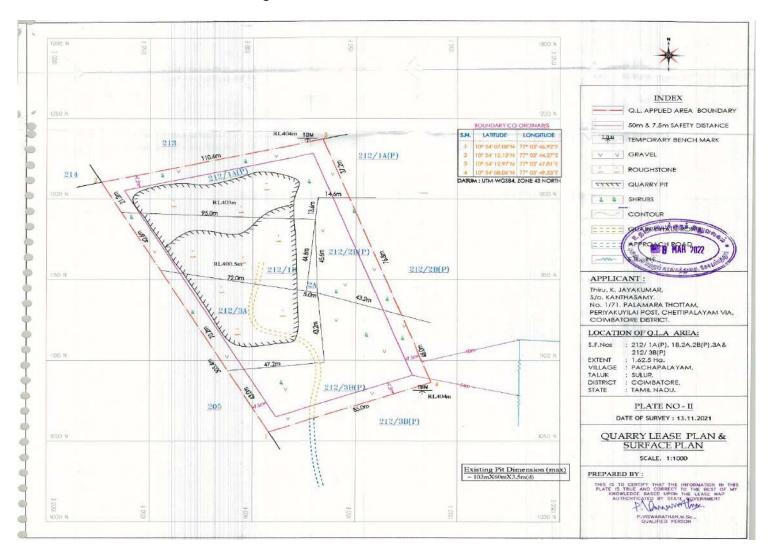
QUARRY LEASE PLAN / SURFACE PLAN – P2
